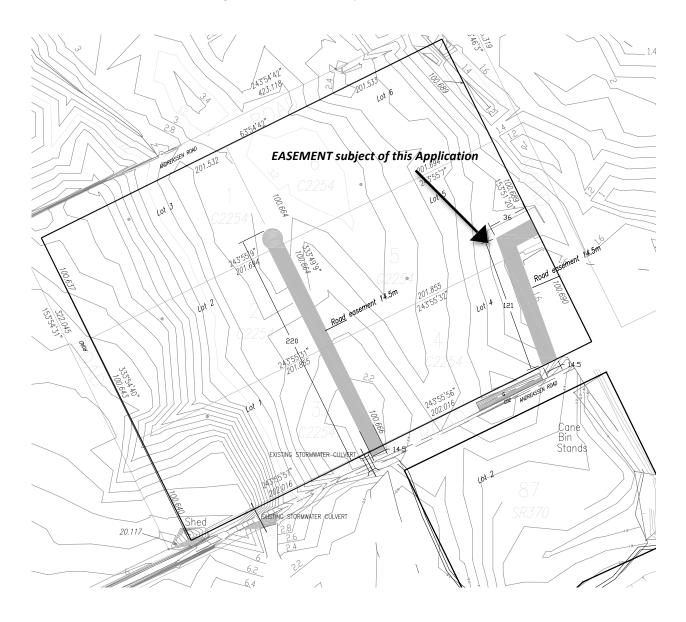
Proposal Plan illustrating Access Easement (Image Courtesy RECS Pty Ltd 2013).
